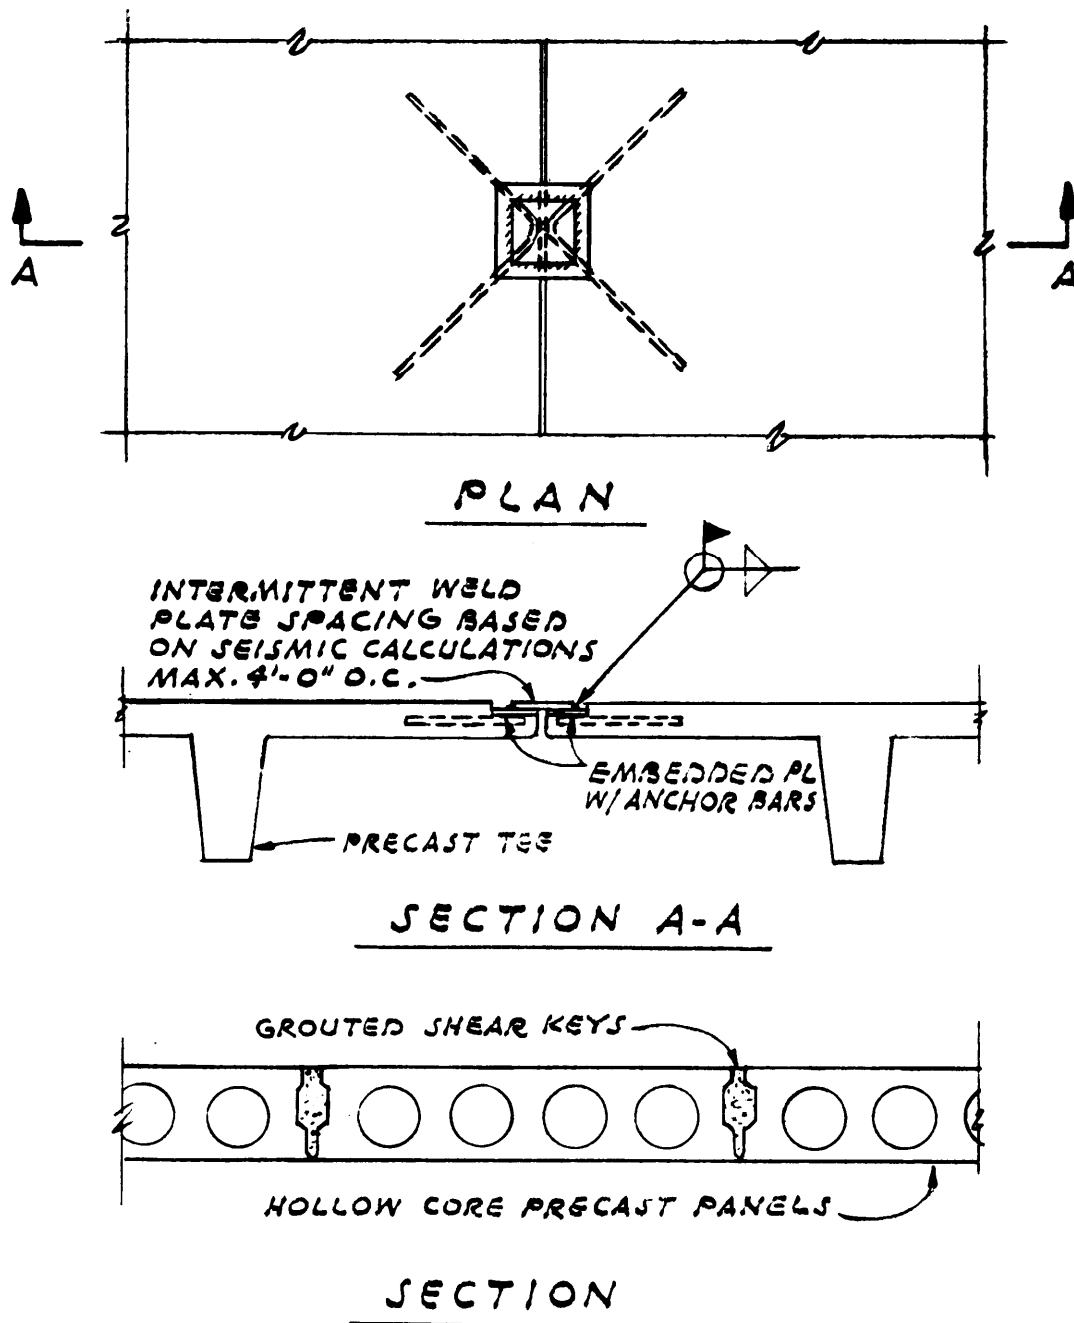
Concrete diaphragms using precast units—details permitted in Seismic Zone 1 only.
